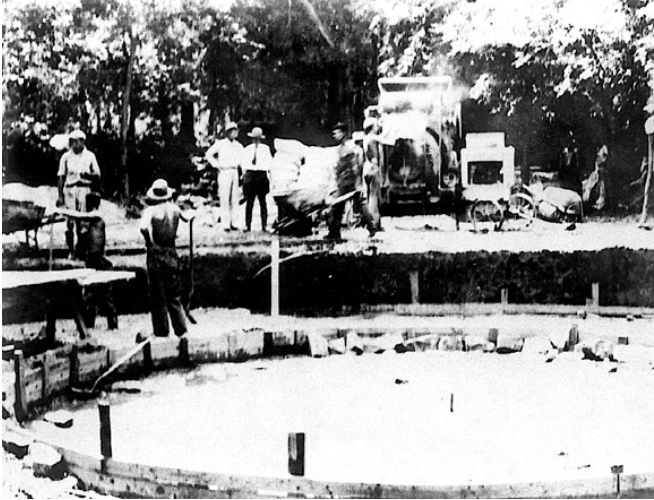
Buffalo Spring enclosure, under construction, 1934, showing concrete formwork.
